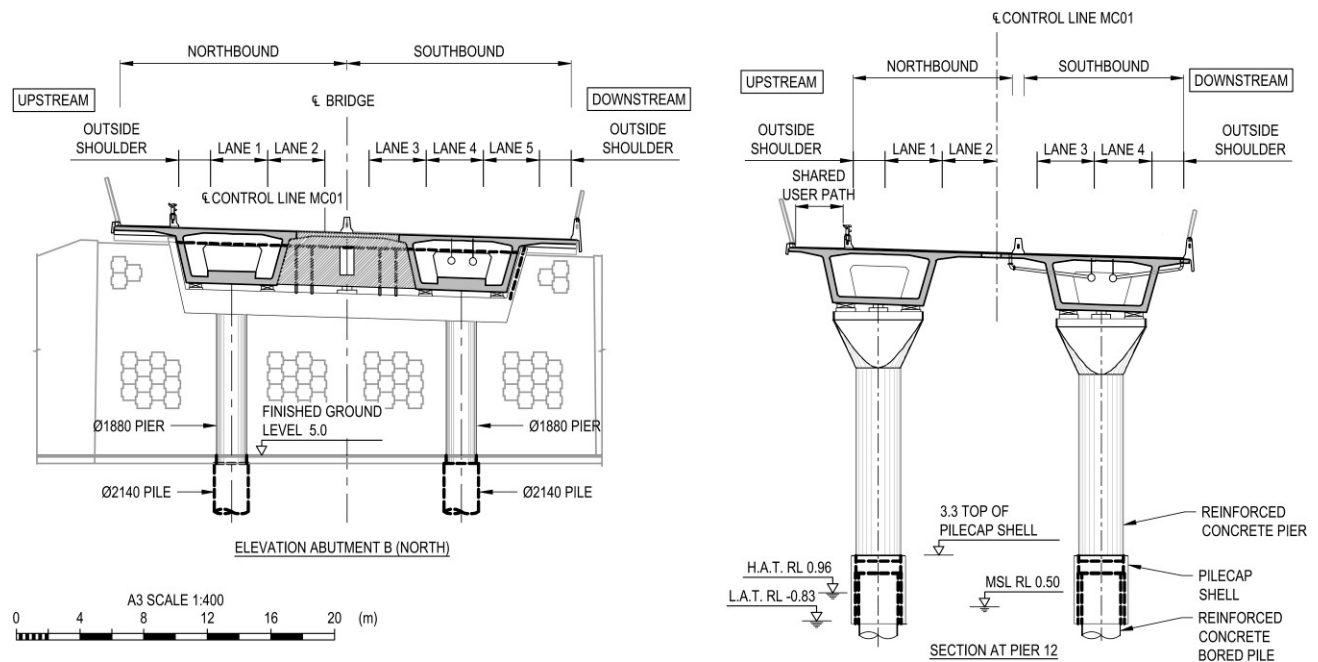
Typical abutment arrangement (LHS) and pier arrangement (RHS)
